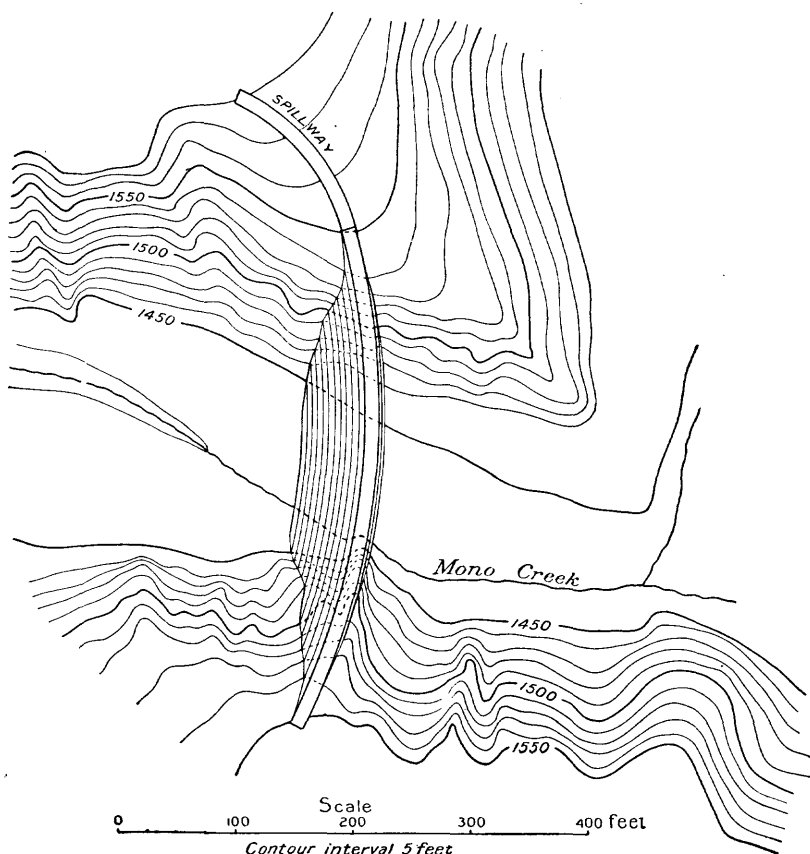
Mono dam site, showing plan for 110-foot concrete dam.
